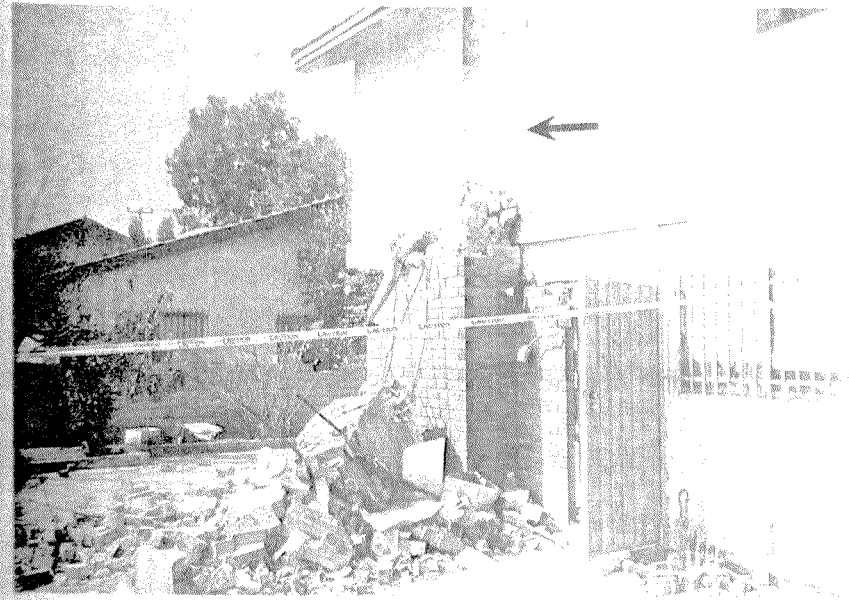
Collapse of brick chimney, 1994 Northridge, California, earthquake.
